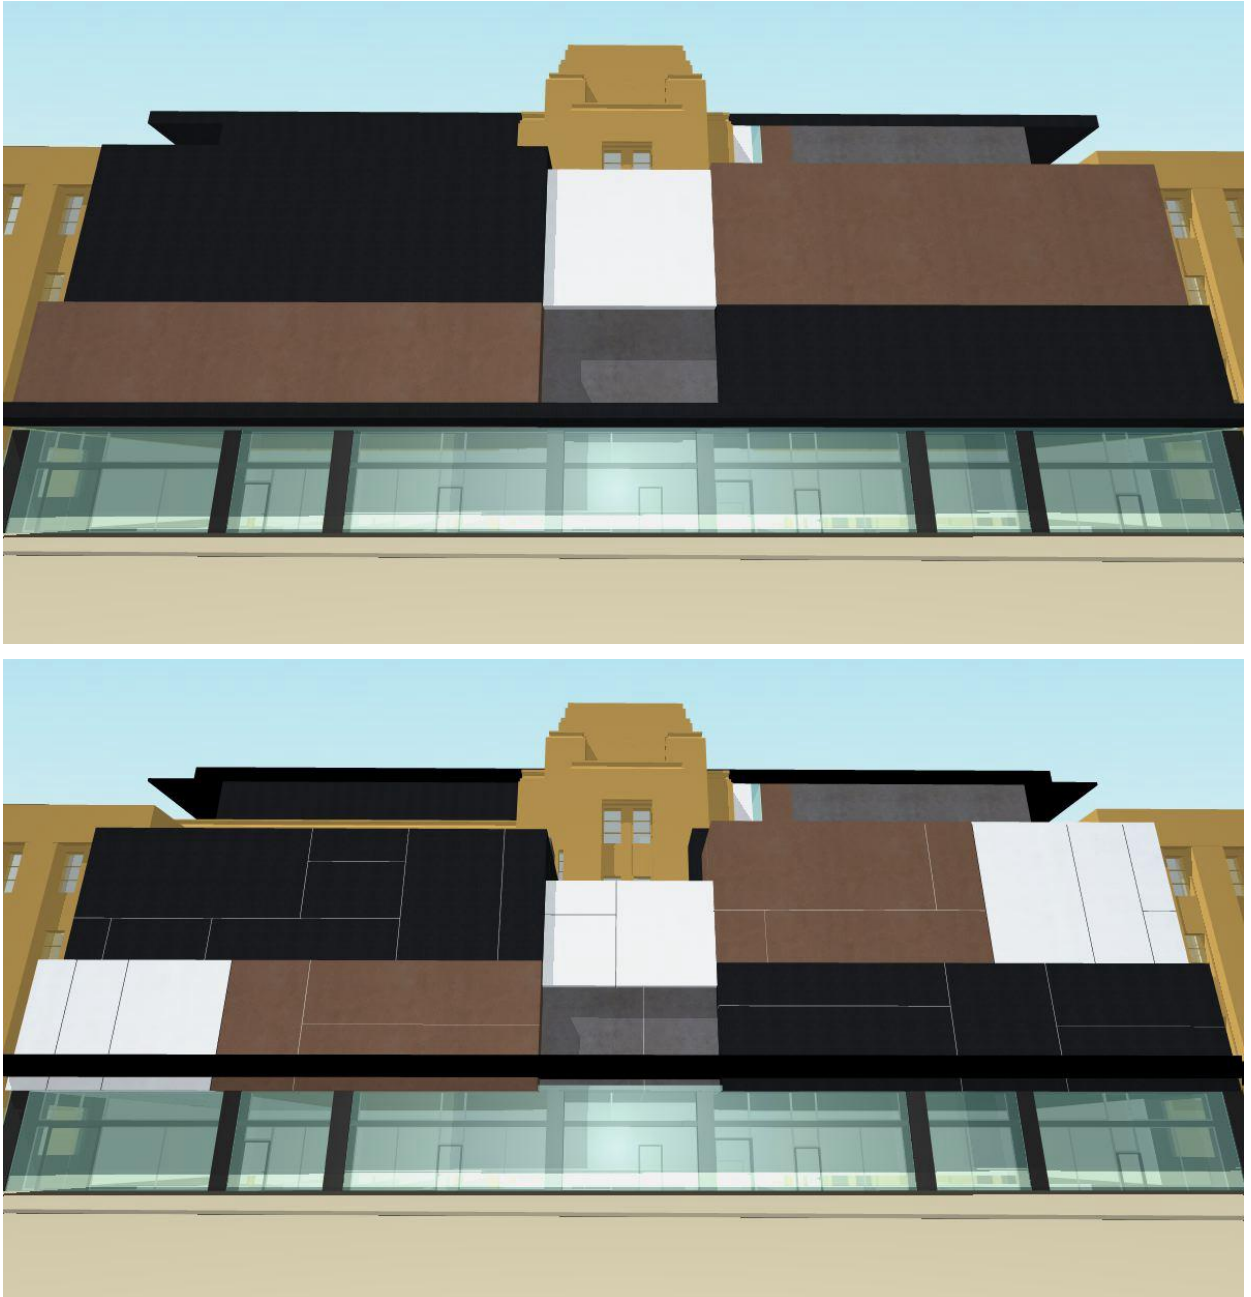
George Street addition as originally proposed and as amended, viewed from the south
